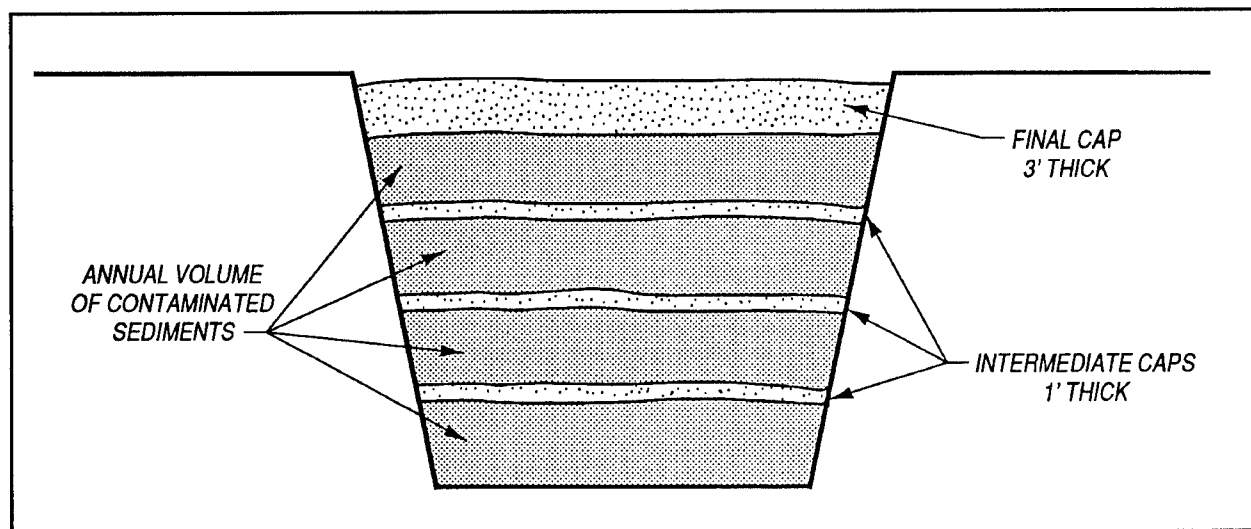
Cross section of single CAD pit showing intermediate and final caps (To convert feet to meters, multiply by 0.3048)
